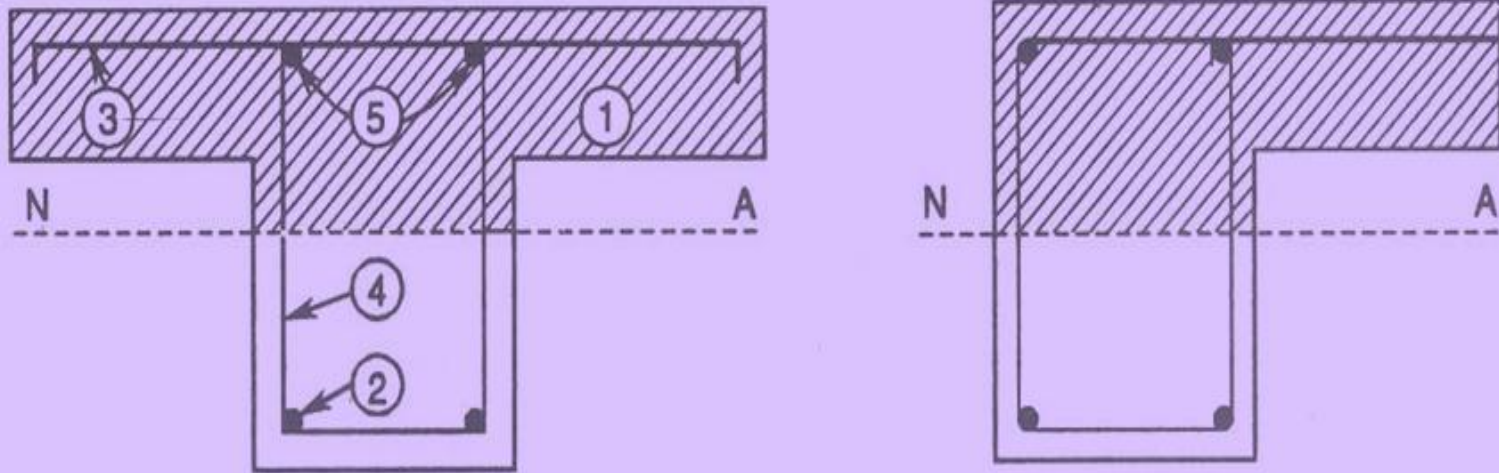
Flanged beams: (a) T beam—1—Compression in concrete; 2—Tension steel; 3—Transverse steel; 4—Stirrups for shear; 5—Anchorage of stirrups; (b) L beam.
